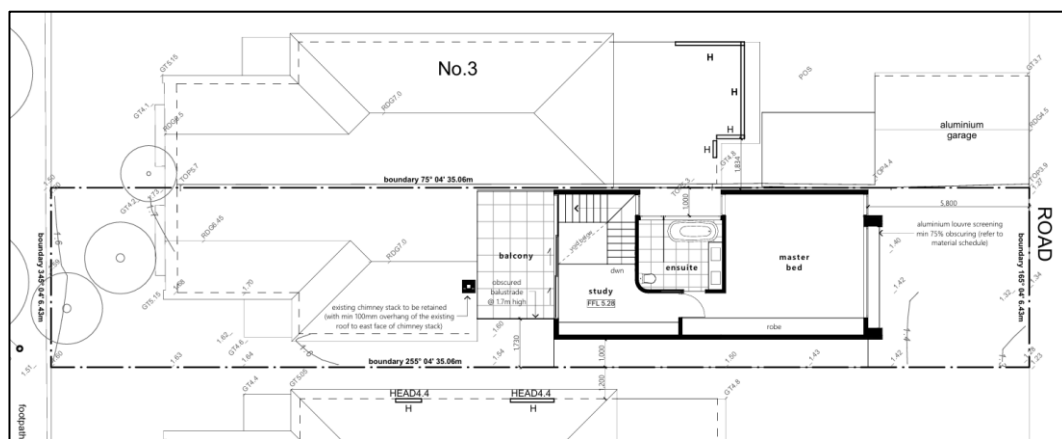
Extract of the proposed first floor plan of 4 Lytton Street (endorsed under PDPL/00528/2025/A)
